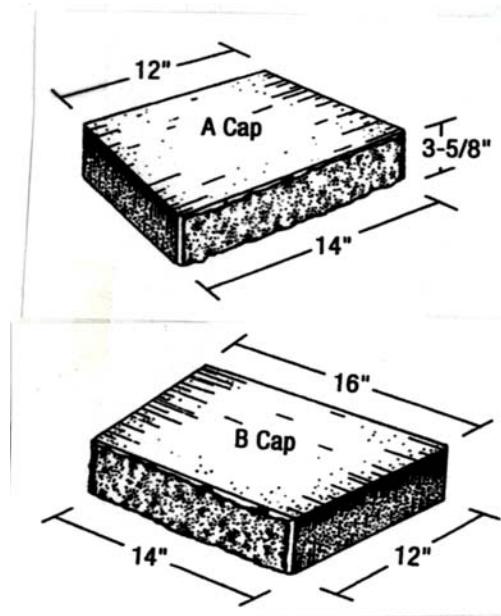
Type A and Type B cap units used to cap straight, convex or concave concrete block retaining walls.
